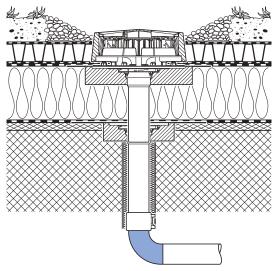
Connecting the Geberit Pluvia roof outlet with a bend 90°
